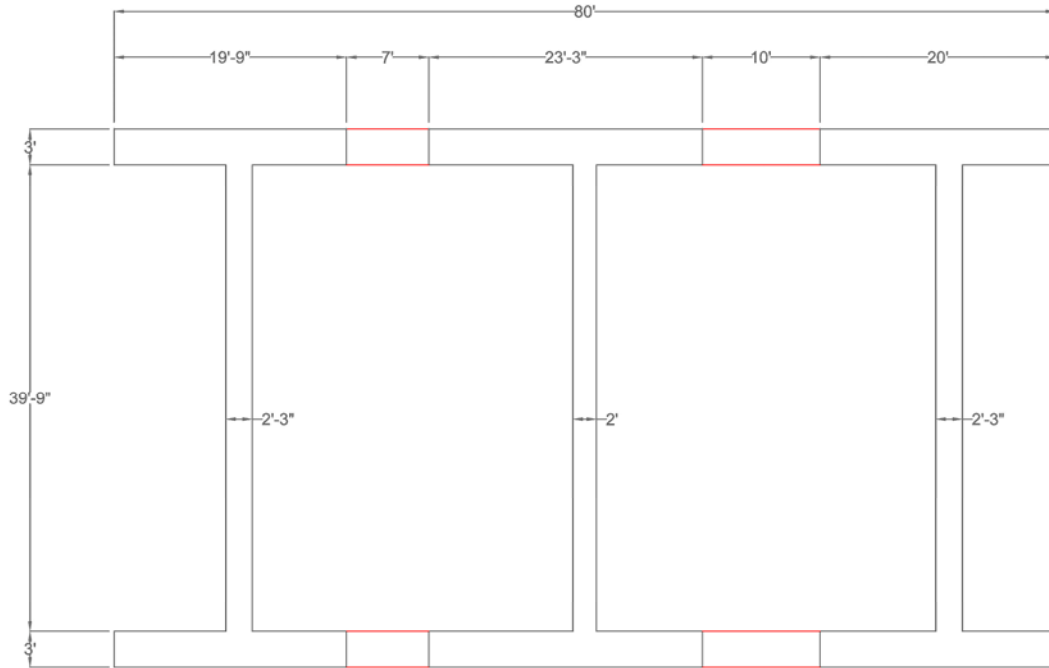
Final Design Core Plan: Lower Level 1 – Level 9
